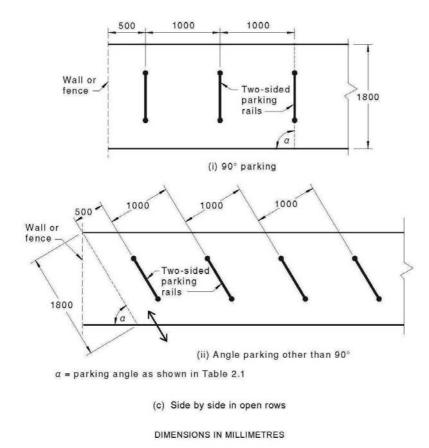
(in part) OPEN PLAN BICYCLE PARKING
